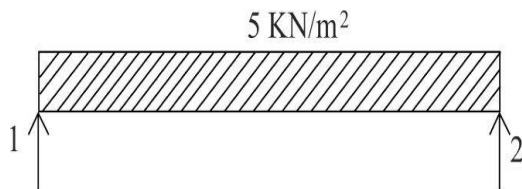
Loading arrangement across deck HB + 1/3HA Loading
